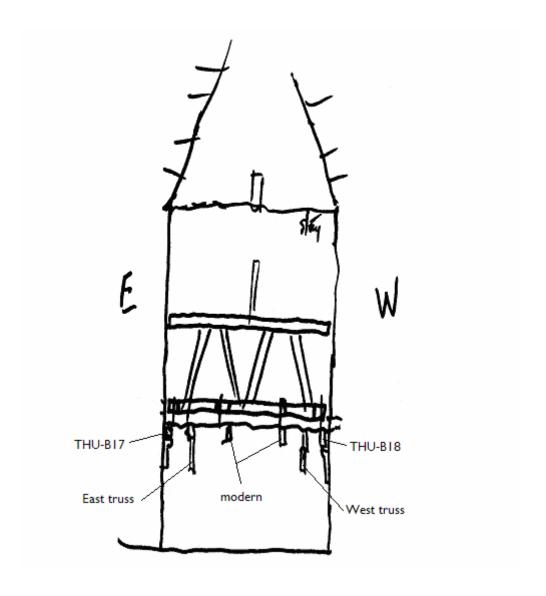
Sketch drawing showing the location of samples THU-B17 and THU-B18 and the position of the east and west truss
